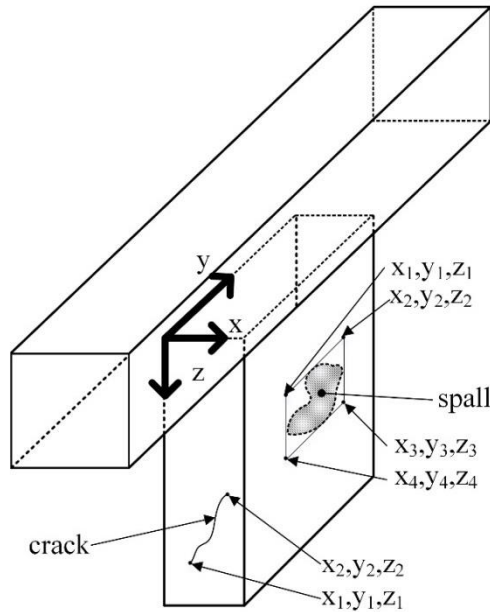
Illustration. Location of local element origin and defect coordinates on square pier column.
